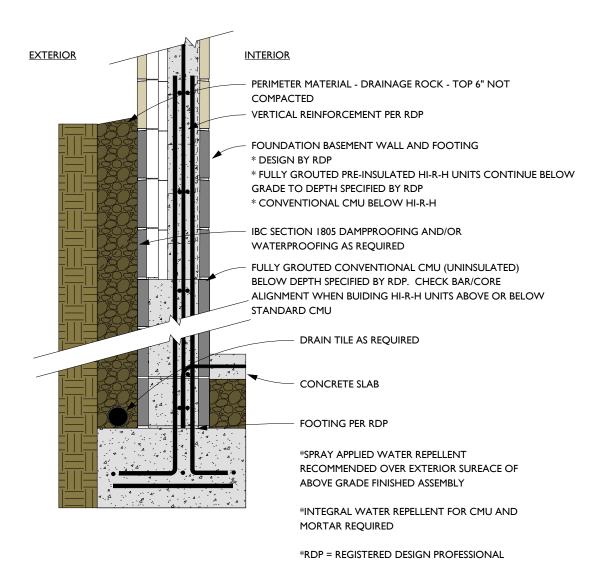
HI-R-H - Foundation - HI-R-H Stem Wall Slab at Grade
